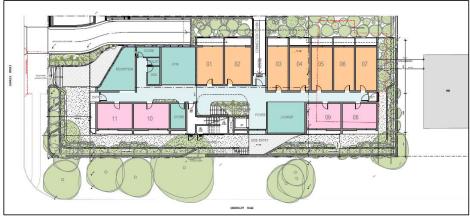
Excerpt from architectural plans; Indicative ground floor plan.
